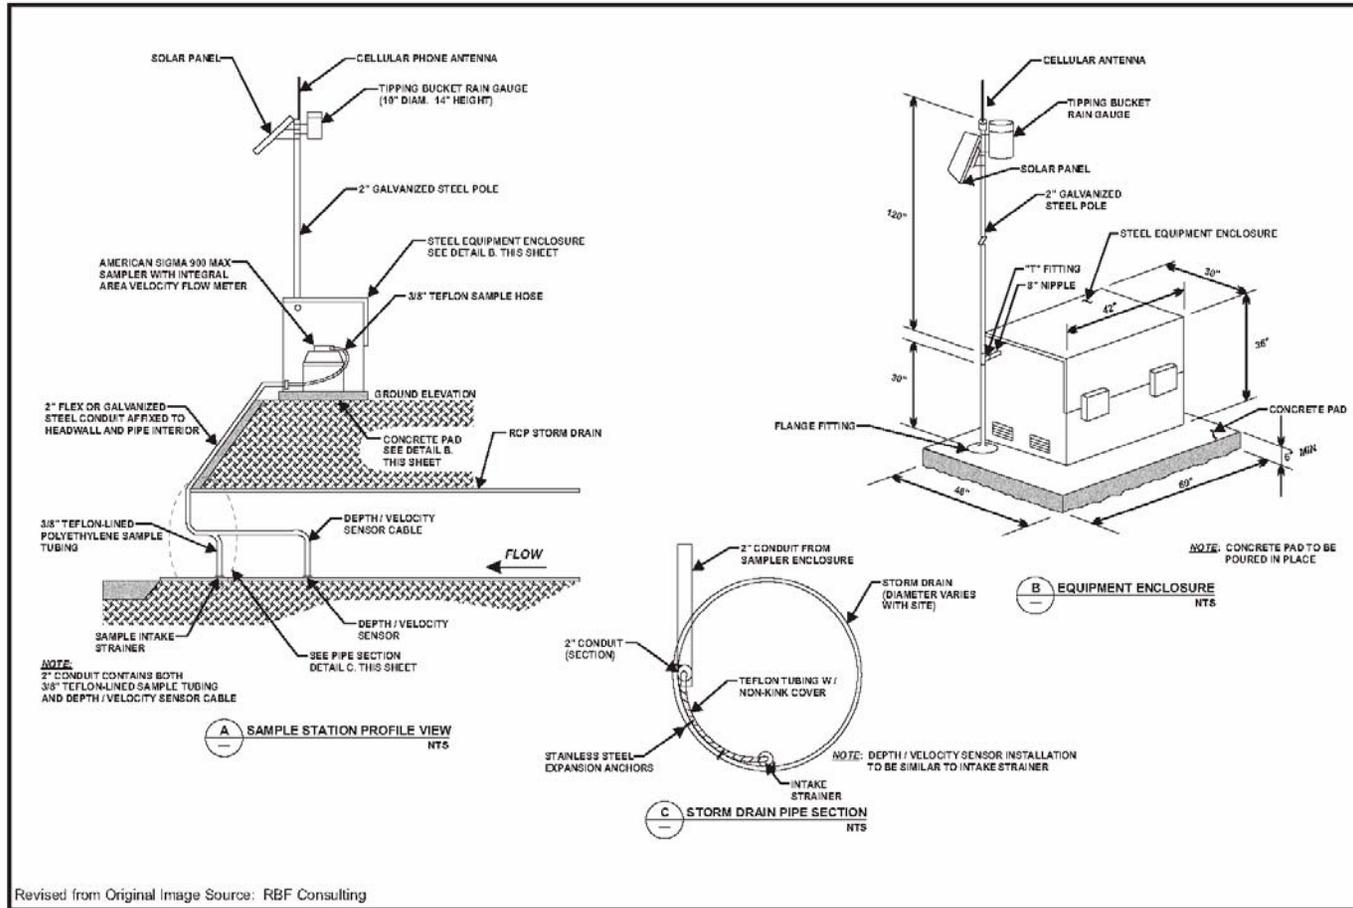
Typical KLASS Stormwater Monitoring Station.
